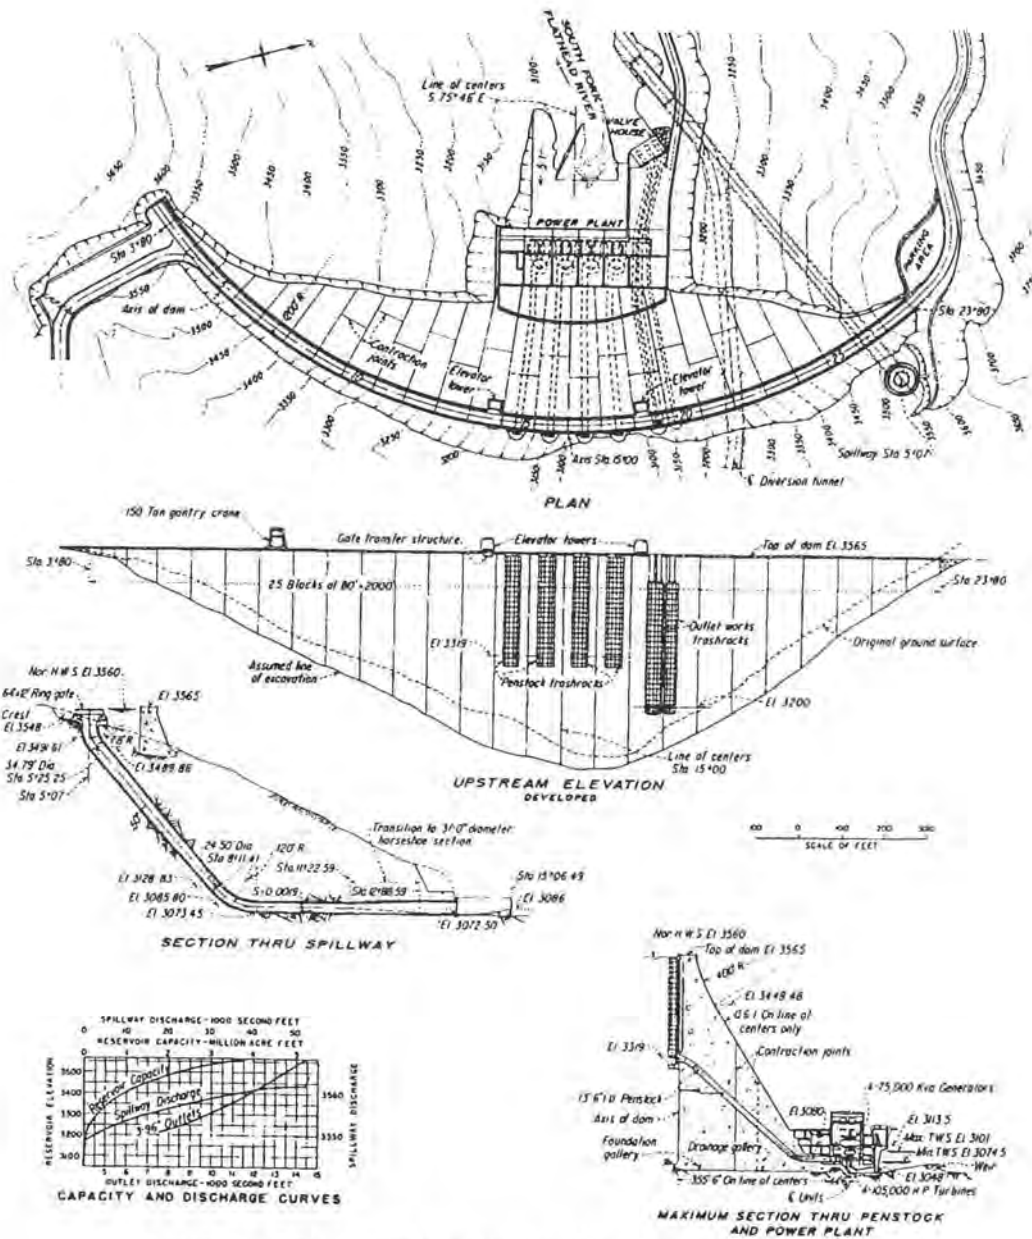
Plan and elevation details. Hungry Horse Dam.
